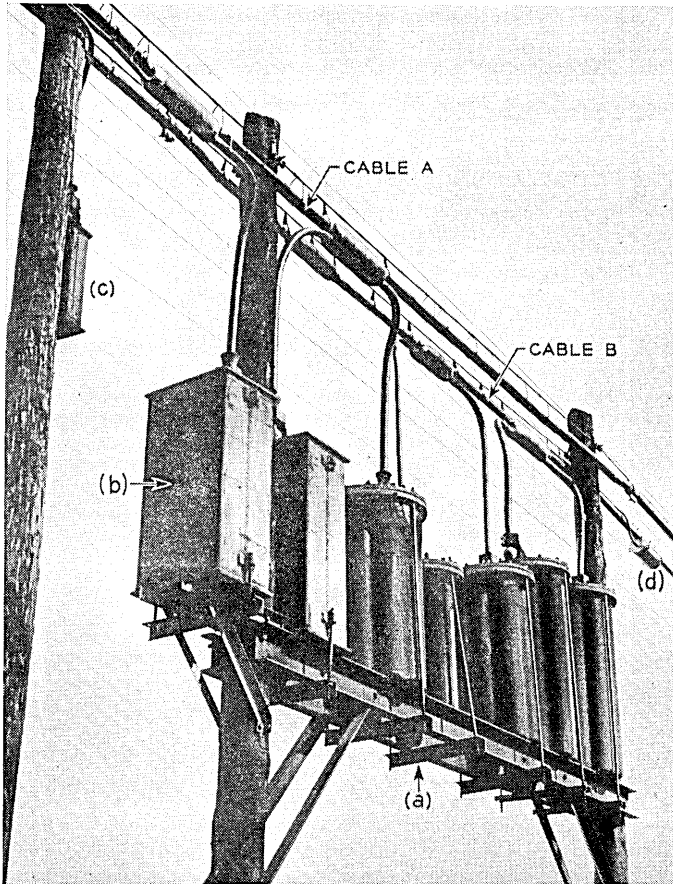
Installed aerial toll cable loading. Four different methods of supporting the loading-coil cases are used in this installation, which provides loading for two cables: (a) On the platform of a 2-pole "H" fixture. (1 large welded steel case, and 5 large cast iron cases.) (b) A pole balcony supporting a large welded steel case. In this installation, it provides an extension of the "H" fixture. (c) A small welded steel case equipped with brackets, and fastened directly to pole. (d) Clamping a small lead-sleeve case to the main cable and its supporting strand. (This case contains program circuit loading coils.)
